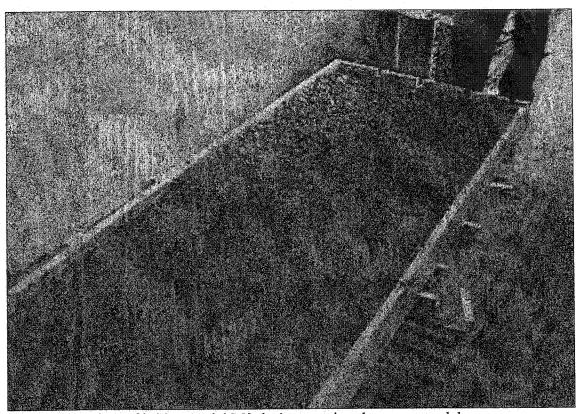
View of bridge model M3 during pouring the concrete slab
